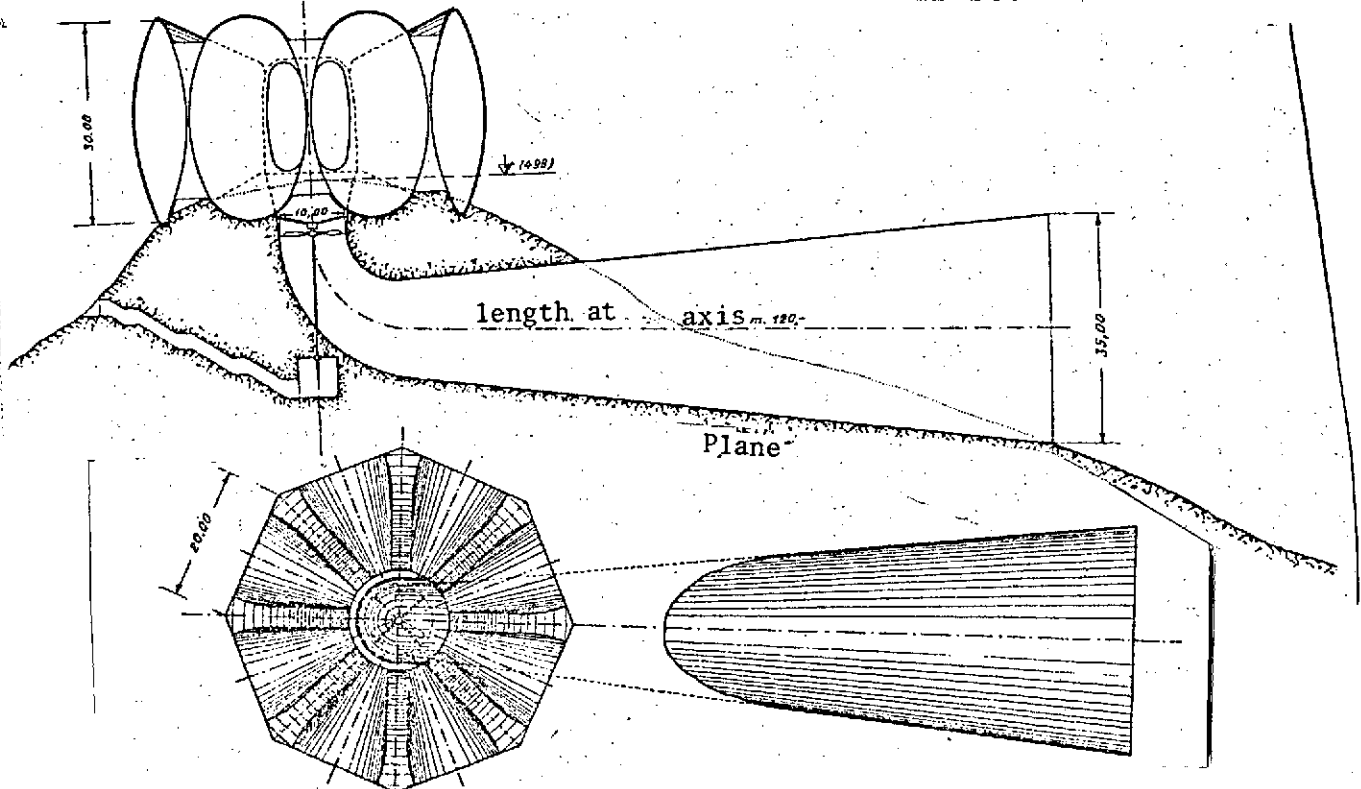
Elevation and plane of the wind-electric plant. The fixed exhaust at the diffusor outlet, still under study, has been omitted.
